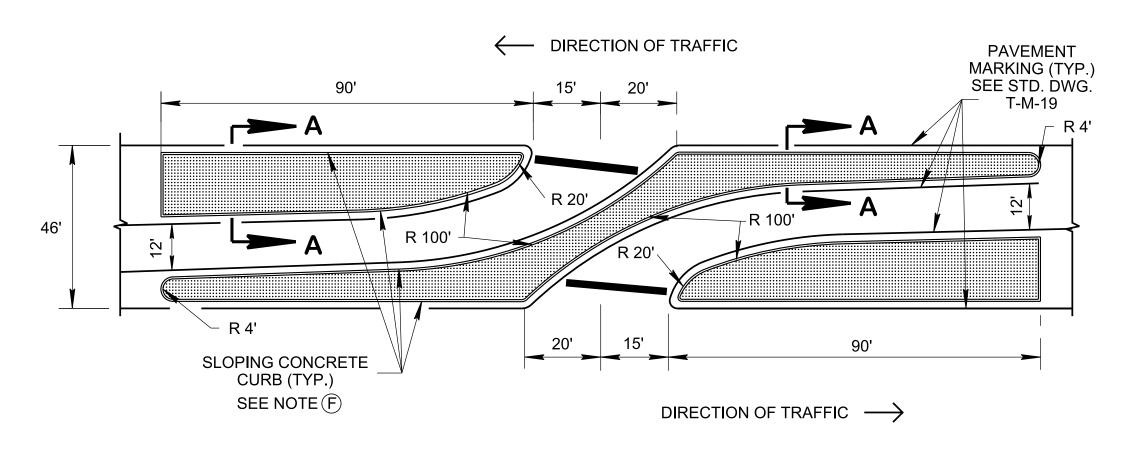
# DETAIL A J-TURN INTERSECTION (REVERSE TO OPPOSITE END)
